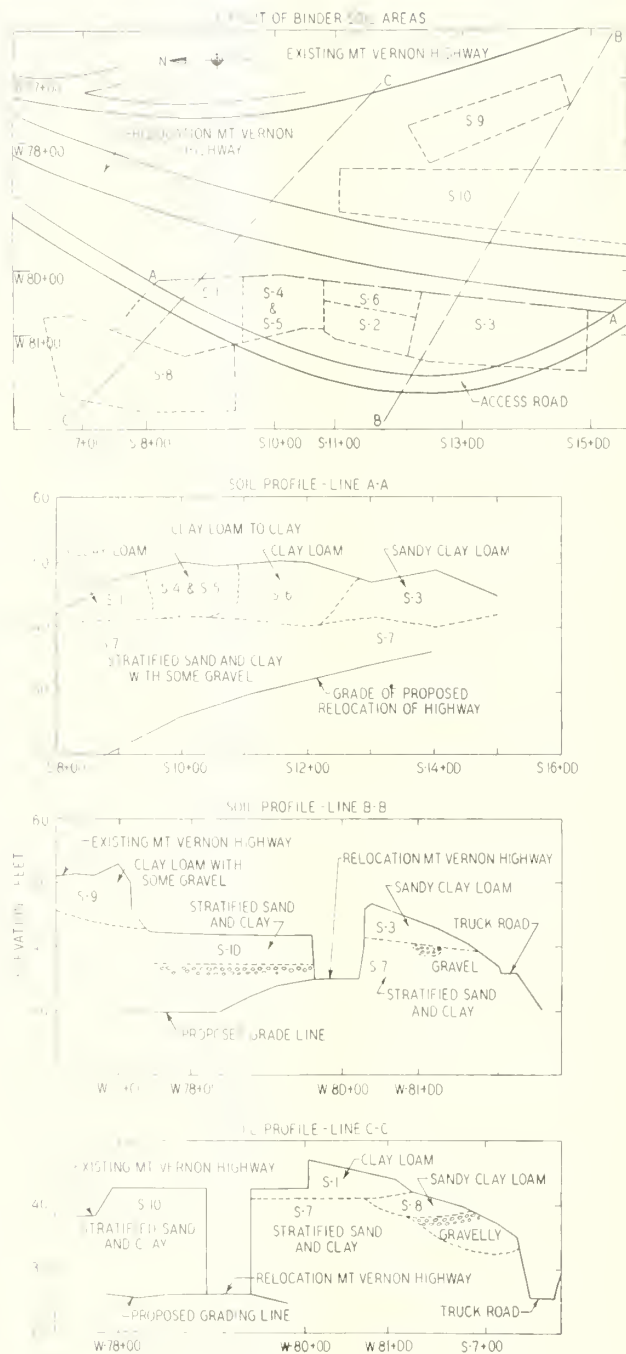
LAYOUT AND SOIL PROFILES OF BINDER SOIL PIT AT ROACHES RUN.
